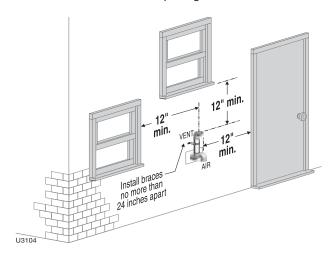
Sidewall termination with separate pipes clearances to public walkway or forced air intake
